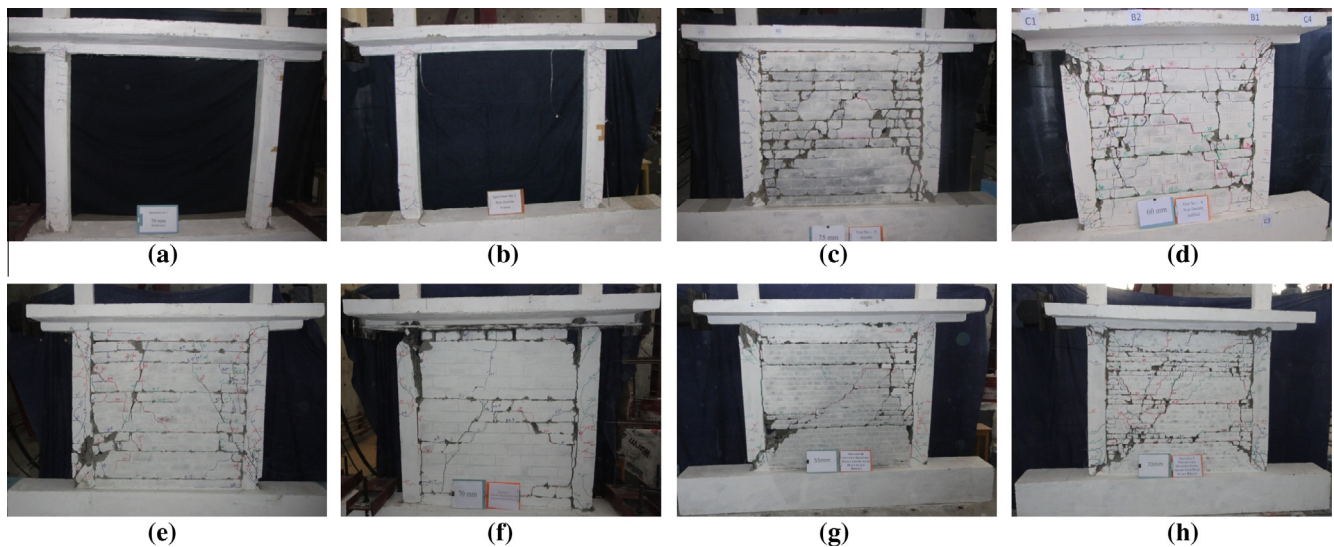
Failure mechanisms observed in specimens 1–8: (a) ductile bare frame; (b) non-ductile bare frame; (c) ductile frame infilled with full-scale bricks; (d) non-ductile frame infilled with full-scale bricks; (e) ductile retrofitted frame infilled with full-scale bricks; (f) non-ductile retrofitted frame infilled with full-scale bricks; (g) ductile frame infilled with half-scale bricks; (h) non-ductile frame infilled with half-scale bricks.
